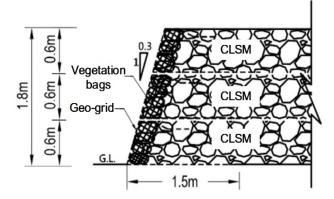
Profile of full scale reinforced embankment constructed with pervious-CLSM
